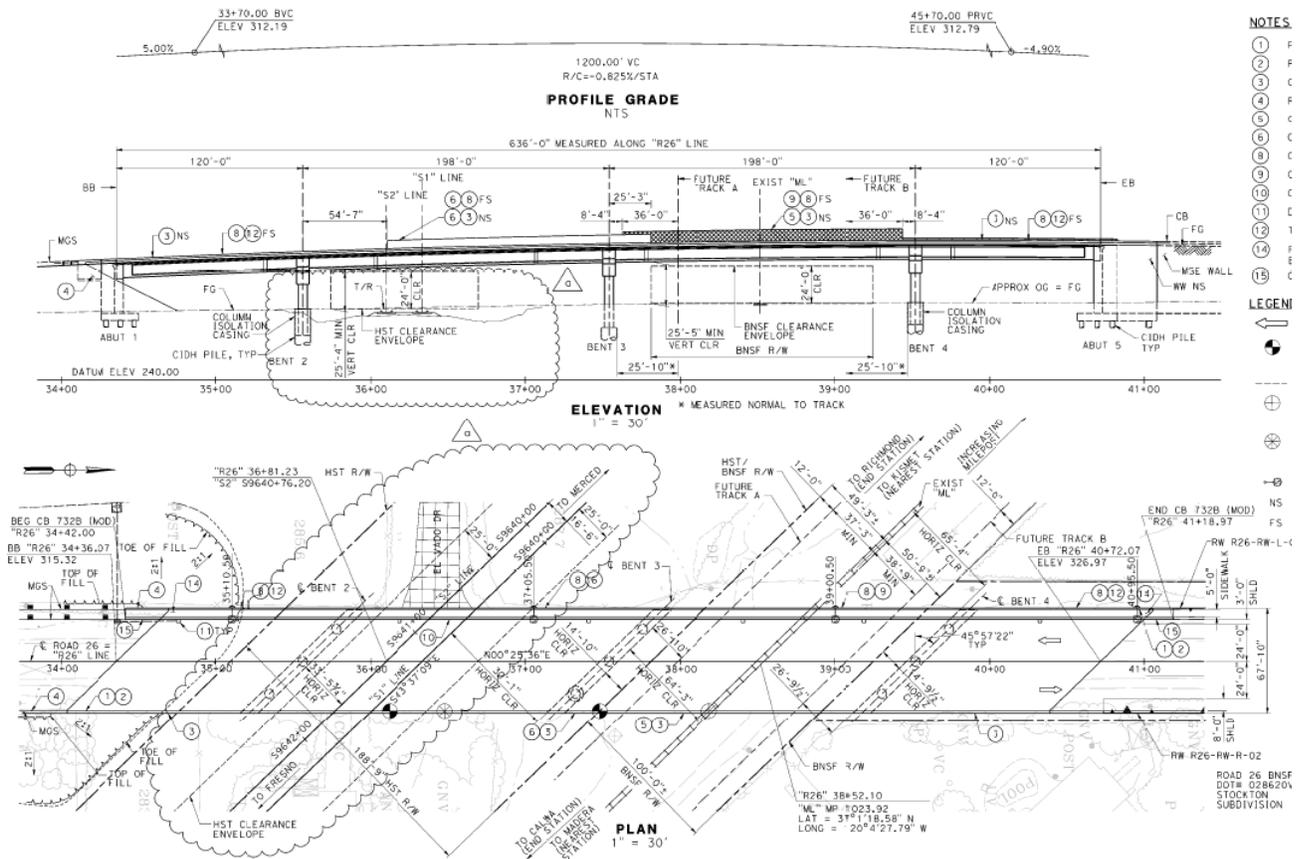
Road 26, General Plan and Elevation of Overpass
